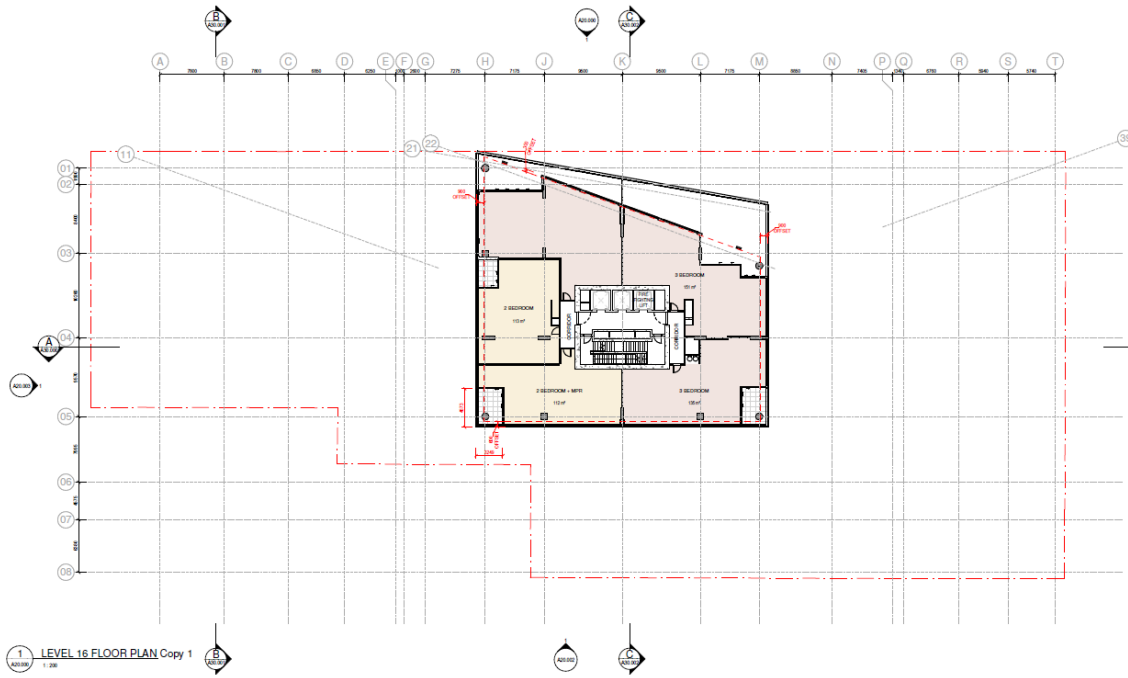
Setbacks at level 16 of the main tower of the proposed building (Source: Warren and Mahoney, 12 November 2025)
